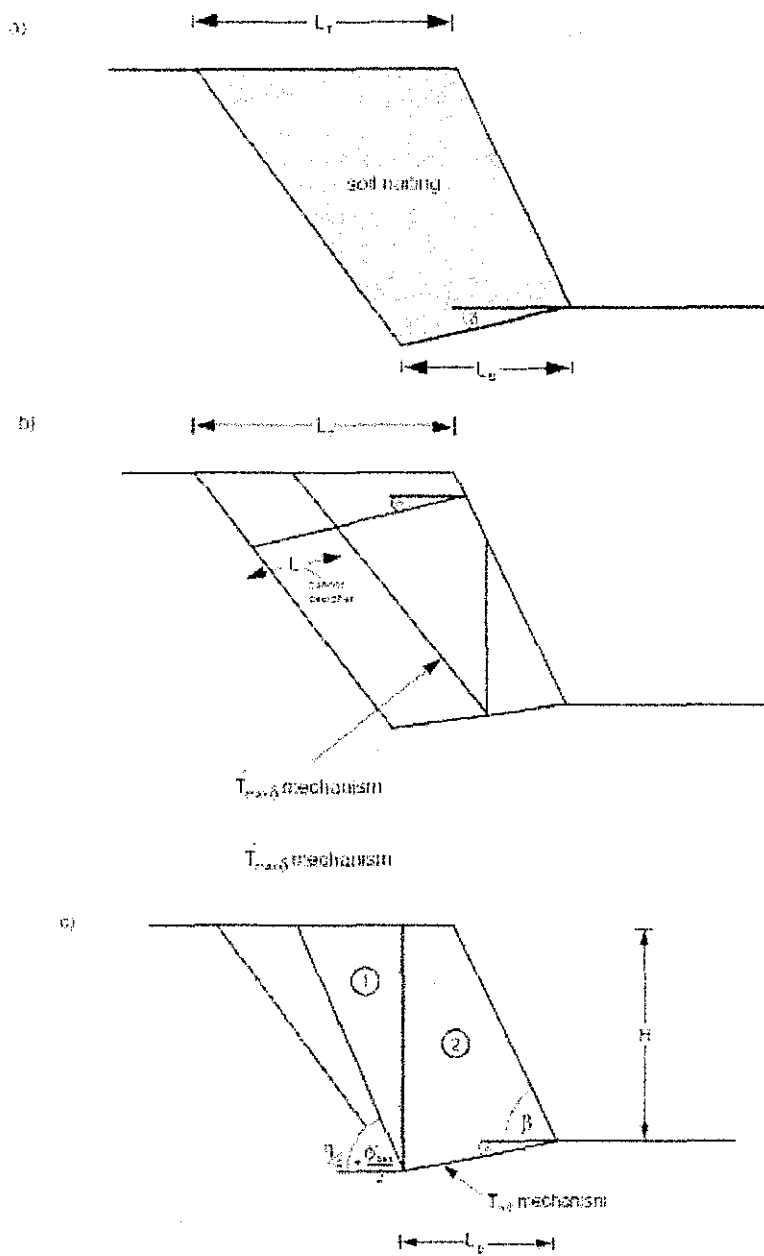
General concepts of design method for soil nail (from HA 68/94).
